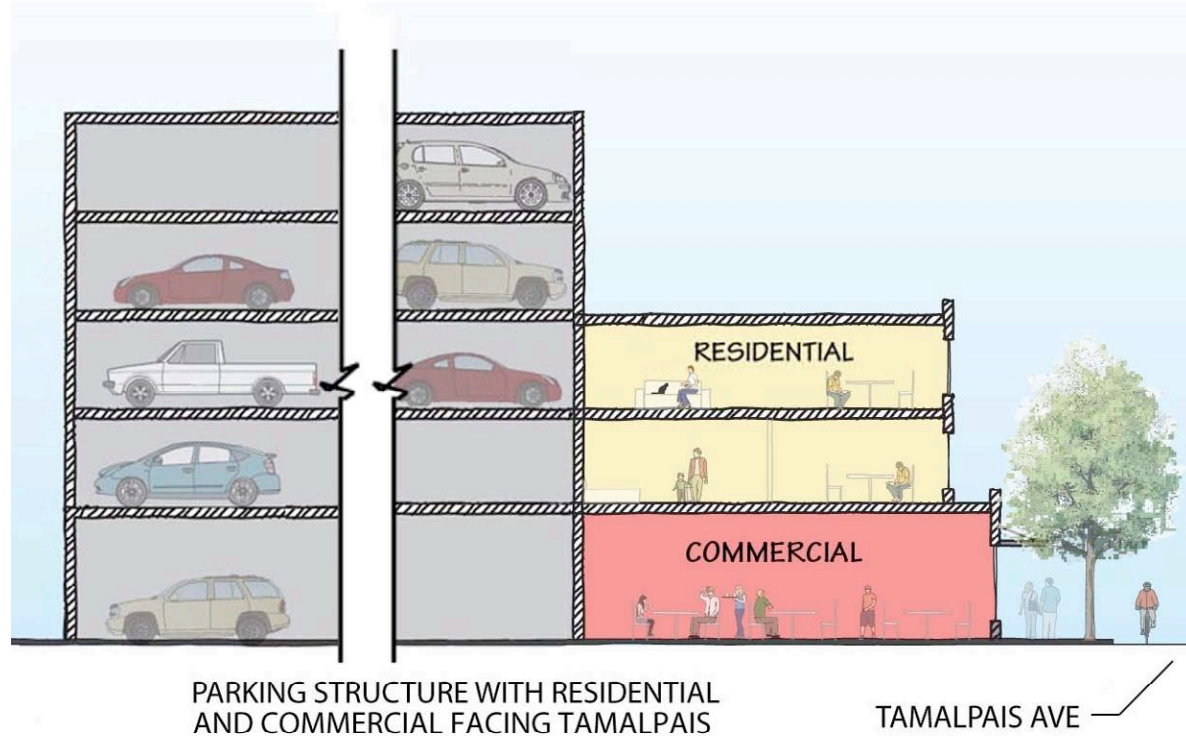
Development Example for Third Street and Tamalpais Avenue – section looking north
